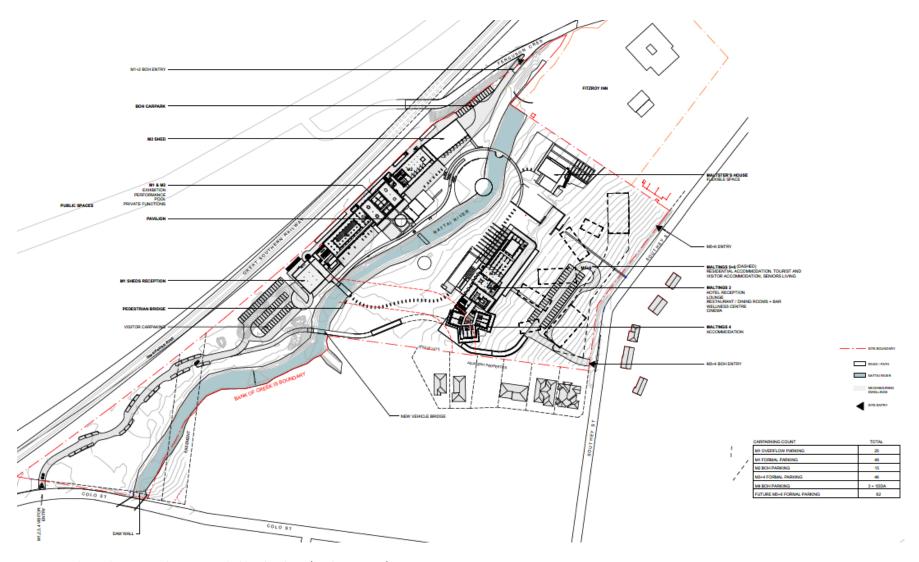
The Maltings site plan as provided by the client (Snohetta 2020)
